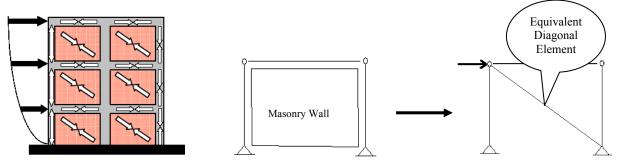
Replacement of CMW by a truss due to lack of rigidity in its tie connections
